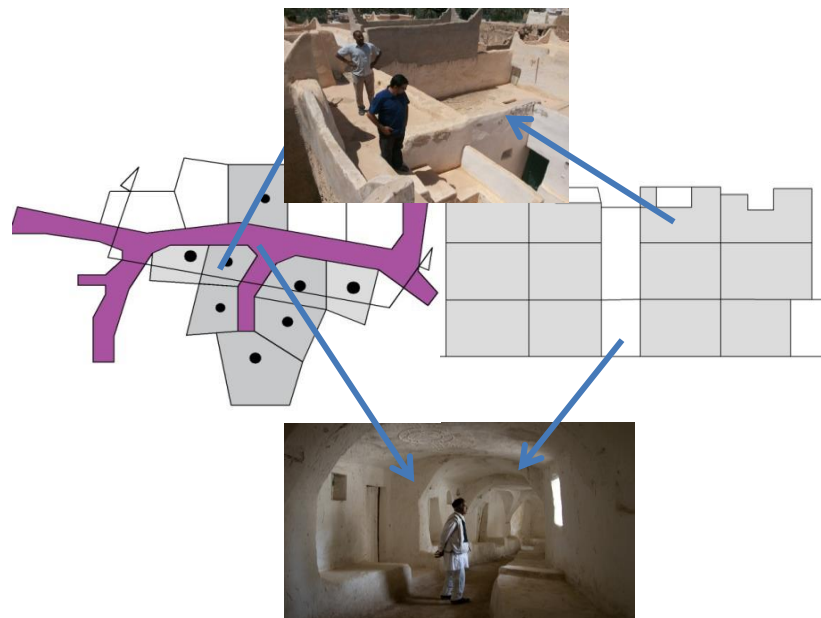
Left, Plan of Roof Passages for Women, Right Section in The Street (source, author).
